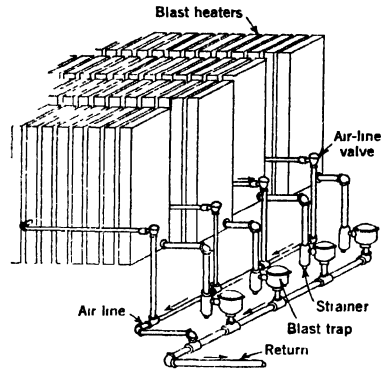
TYPICAL CONNECTIONS TO CENTRAL FAN SYSTEM HEATING UNITS EXCEEDING 12 SECTIONS
